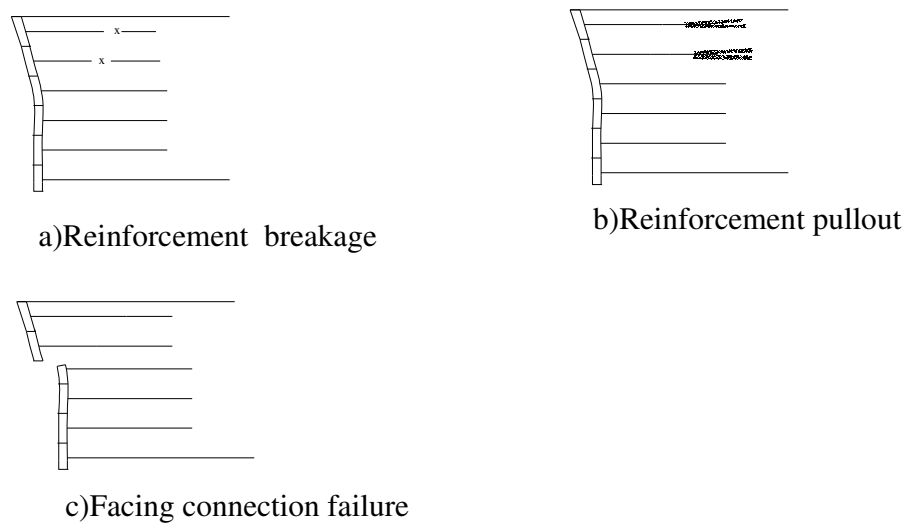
Potential failure mechanisms for internal stability of reinforced earth retaining wall.
